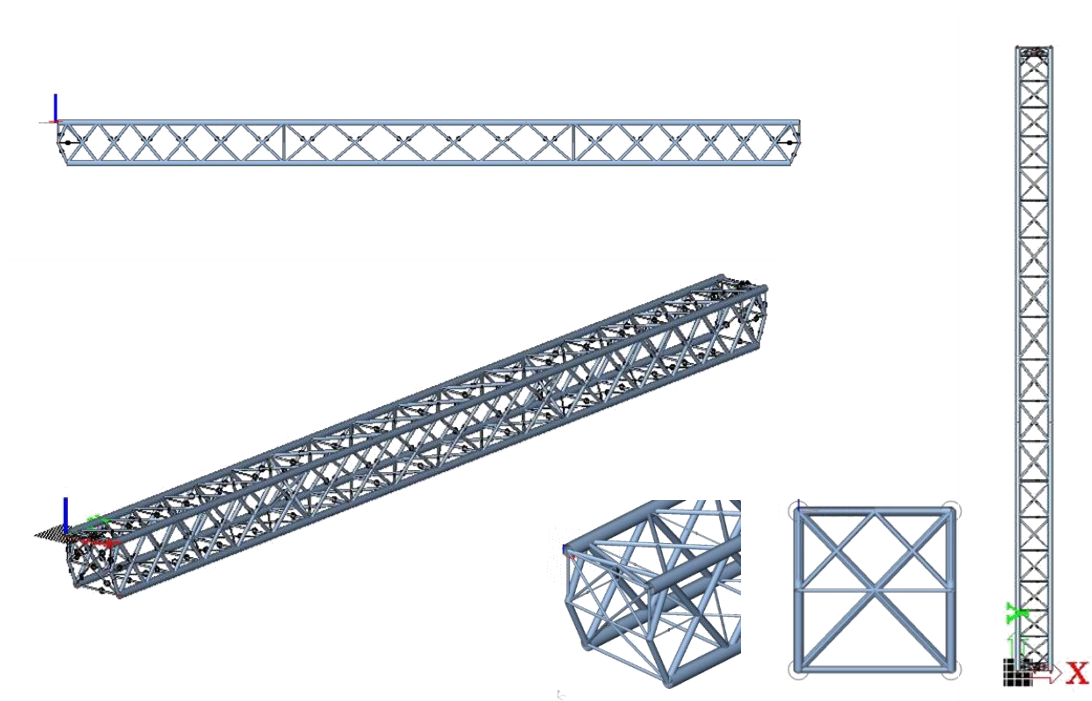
DIFFERENT VIEWS OF THE LATTICE BRIDGE GIRDER SEGMENT AT THE MAIN SPAN
